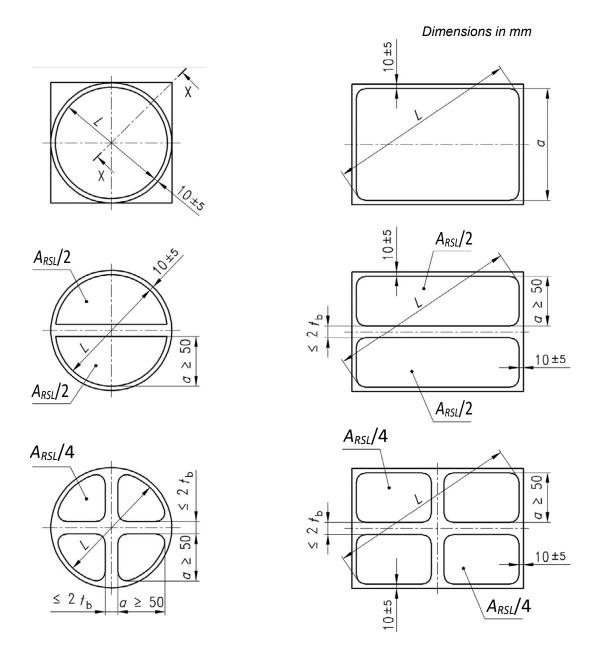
Examples of recessed flat ROBO®SLIDE L2 configurations
